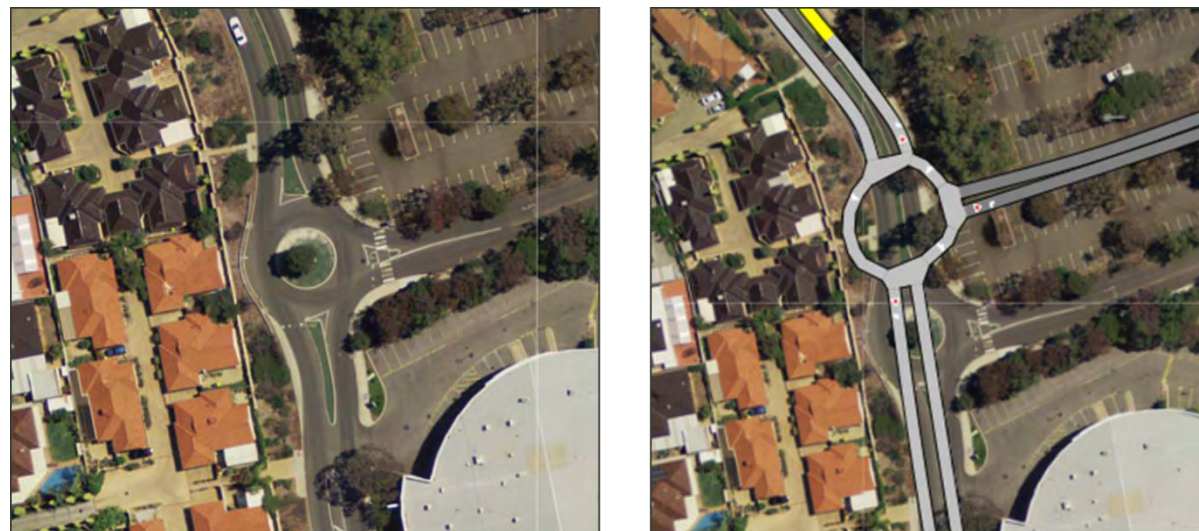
Proposed upgrade of Davy Street/ Garden City intersection
